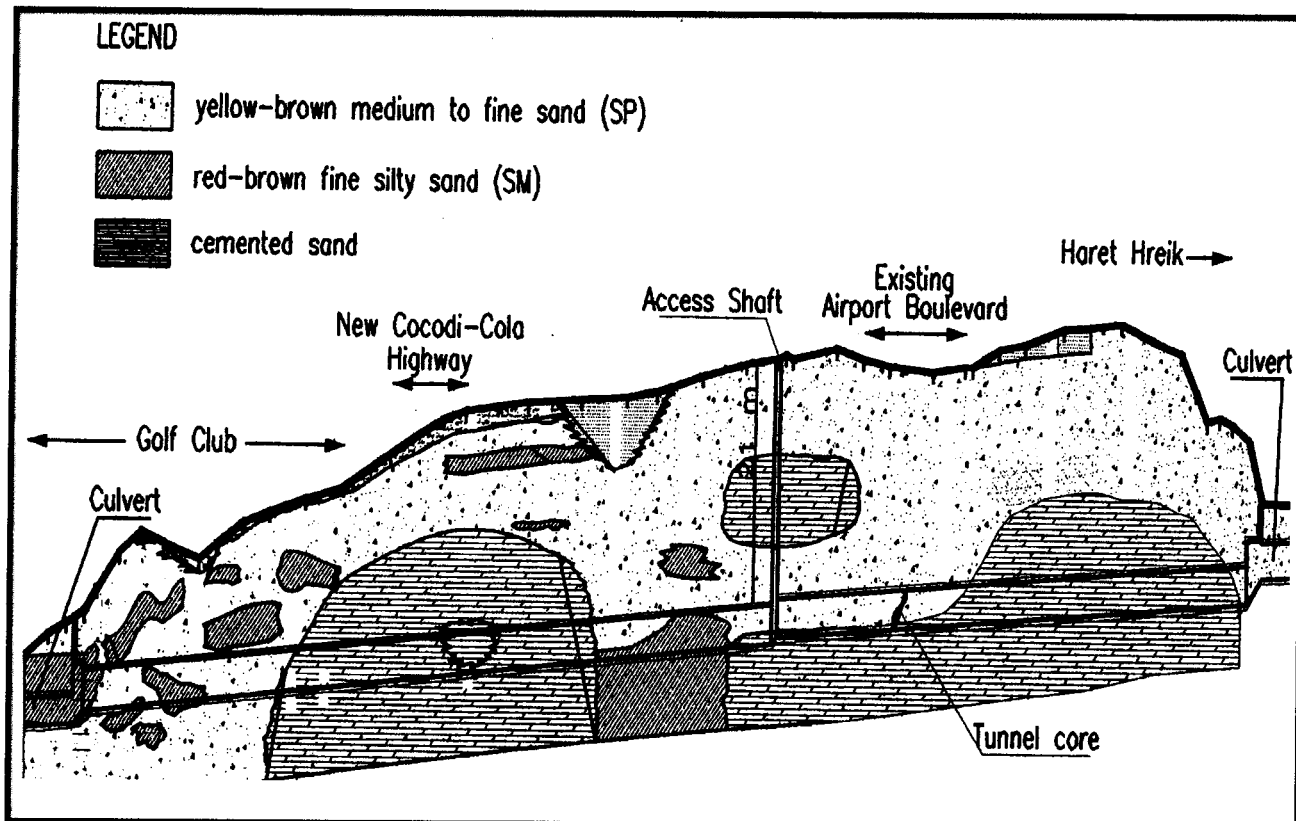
Geologic Profile Along Tunnel Alignment (Horiz. 1 cm = 100 m, Vert. 1 cm = 7 m)
